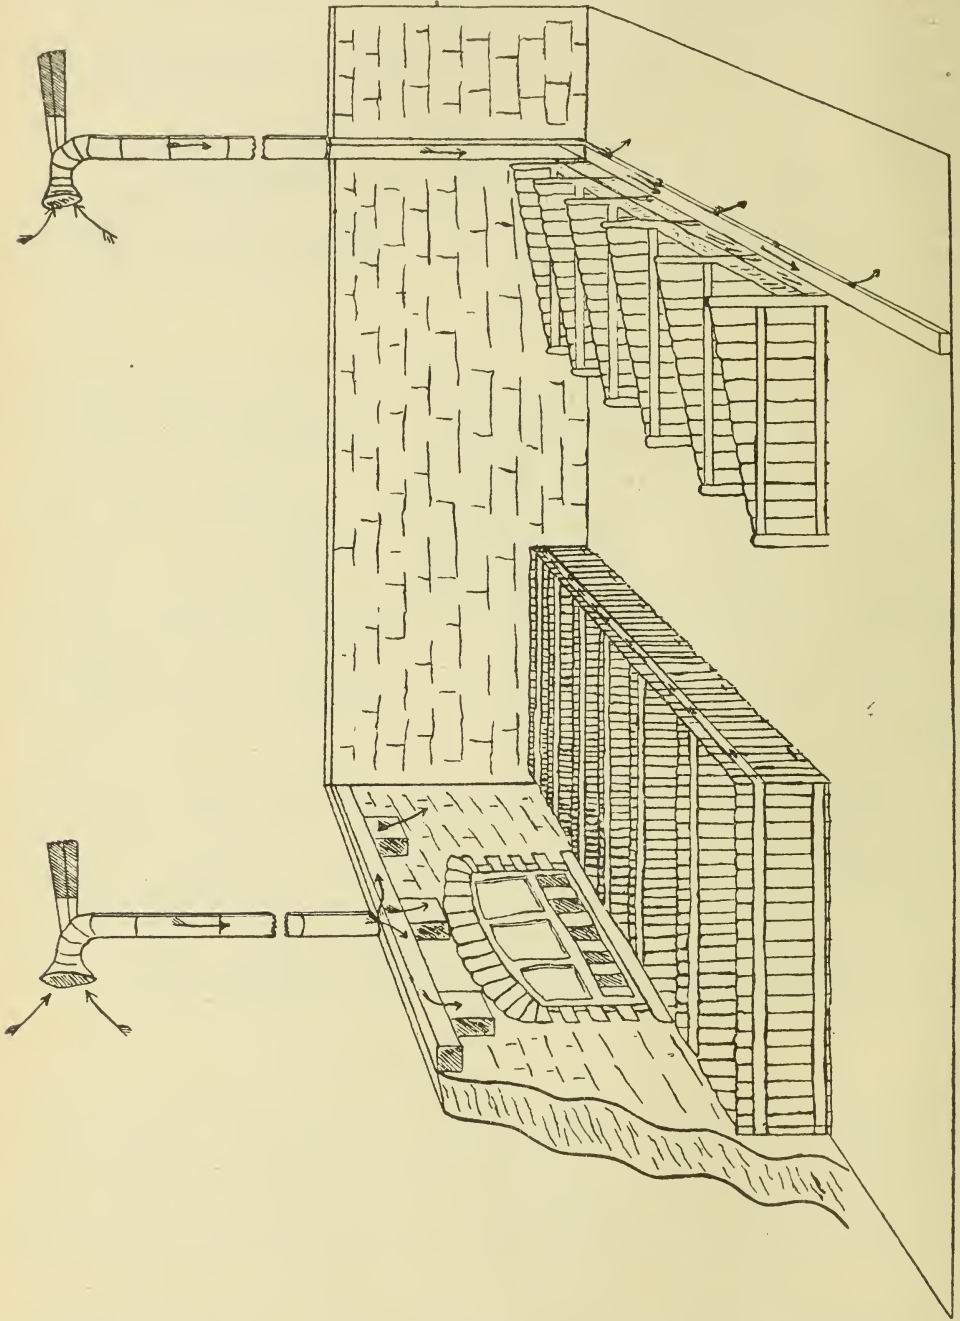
Showing fresh air brought in, in part at the floor, and in part at points between floor and ceiling. A system adapted to stables already built.
